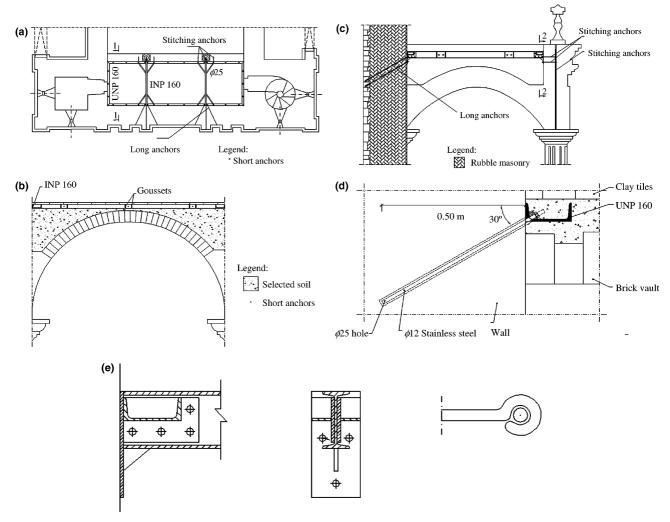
Remedial measures: (a) general plan; (b) section 11 (channel section UNP 160); (c) section along the ties (I section INP160); (d) detail of a short anchor; (e) section 22 and detail of the connection between vertical and horizontal stitching ties.
